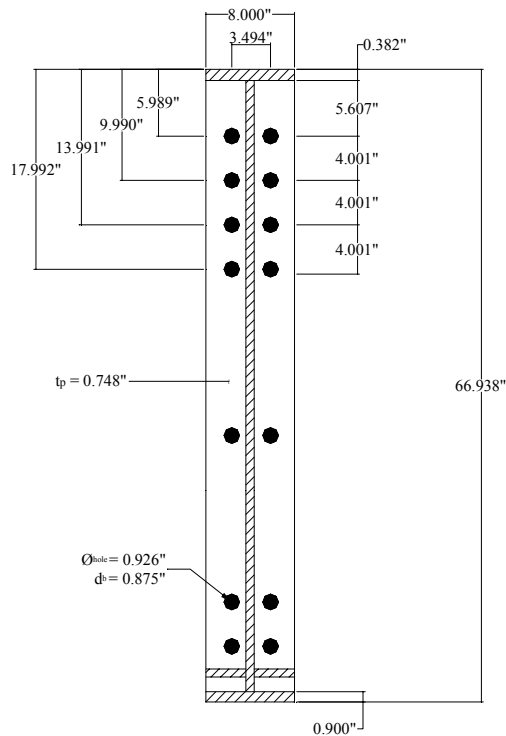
Specimen Nominal Dimensions for Test F4-7/8-3/4-67
